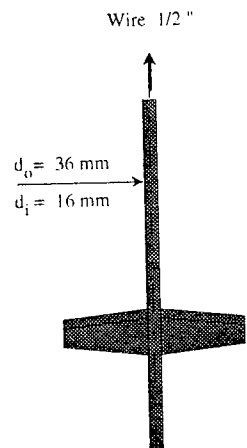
Details of the inverted wing penetrometer for in situ strength testing of stabilized columns (Rathmeyer, 1996).
